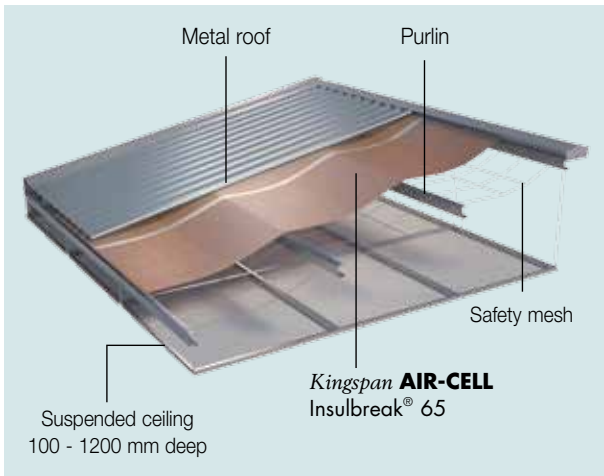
Kingspan AIR-CELL Insulbreak® 65 in a commercial office installation
